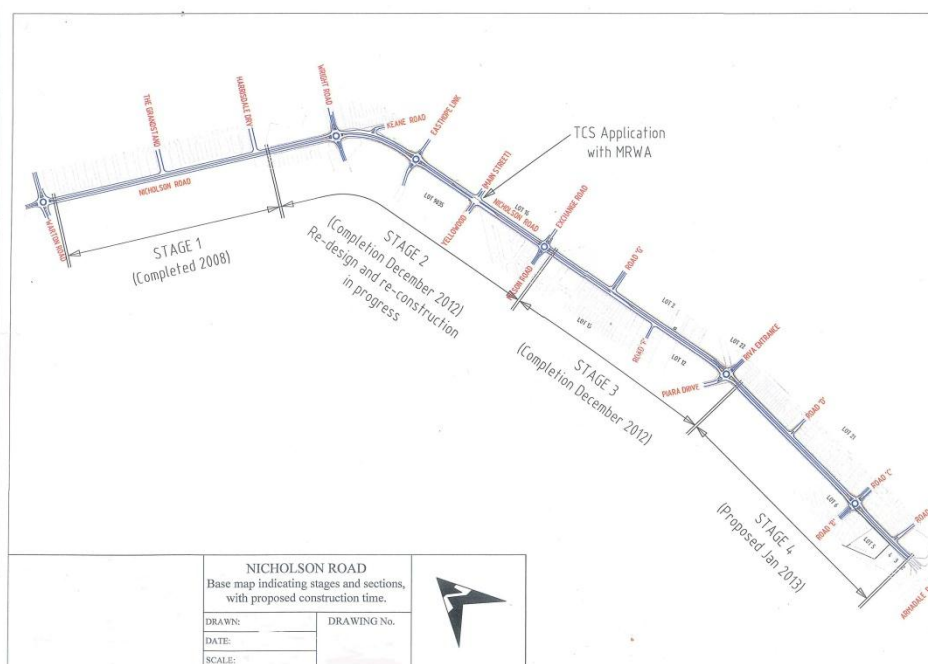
Stages of development on Nicholson Road from Armadale Road to Warton Road (X 2012)
